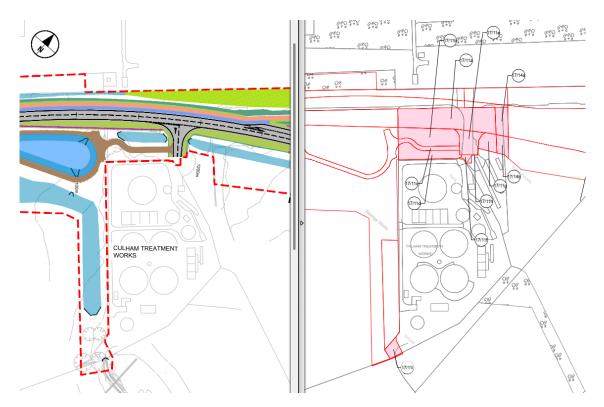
Proposed layout adjacent to Thames Water Treatment Works (on the left) and TW land plots subject to CPO (on the right)
